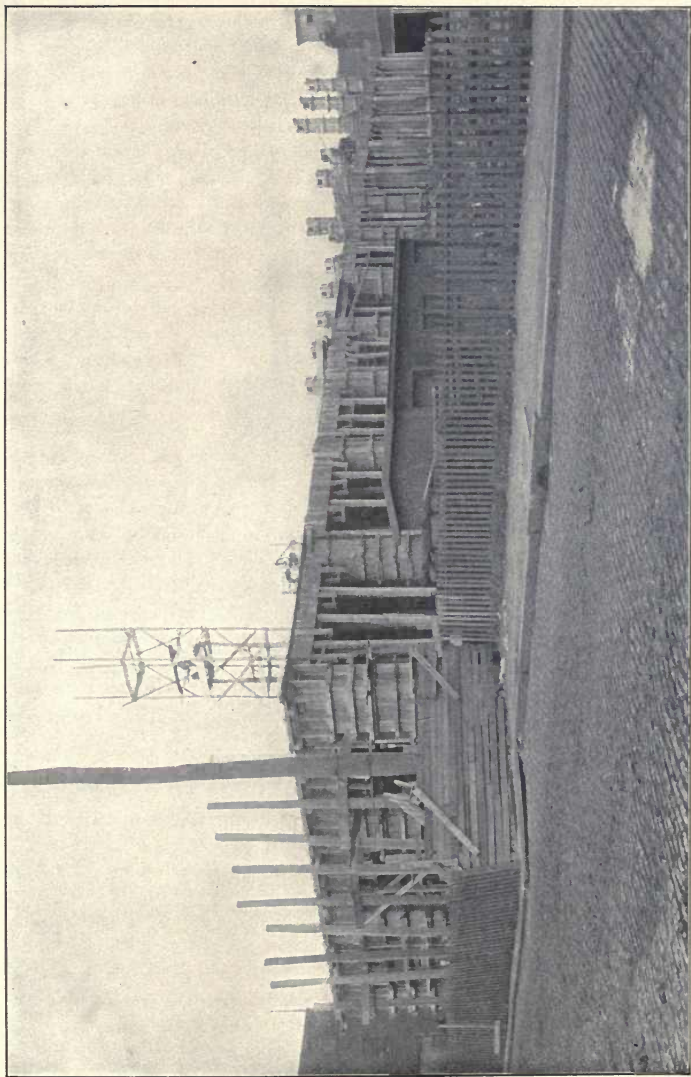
Lynn Storage Warehouse at Second Floor Level. (See p. 82.)
